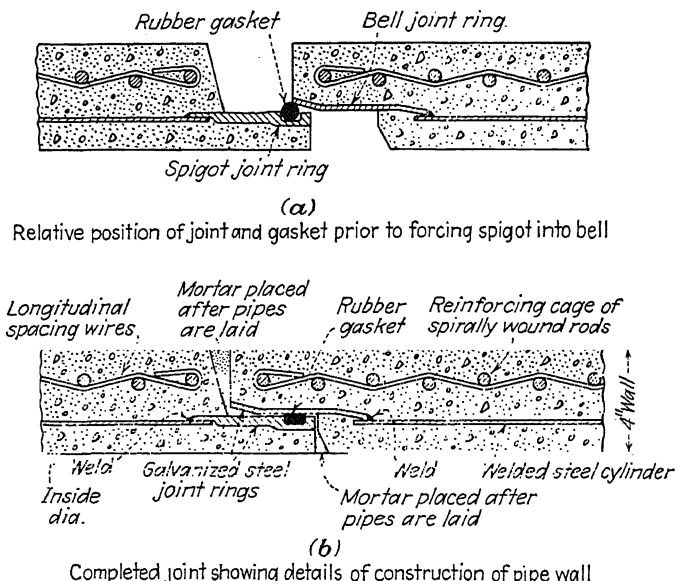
Steel-cylinder reinforced concrete pipe with rubber-gasket expansion joint. (a) Relative position of joint and gasket prior to forcing spigot into bell. (b) Completed joint showing details of construction of pipe wall.
